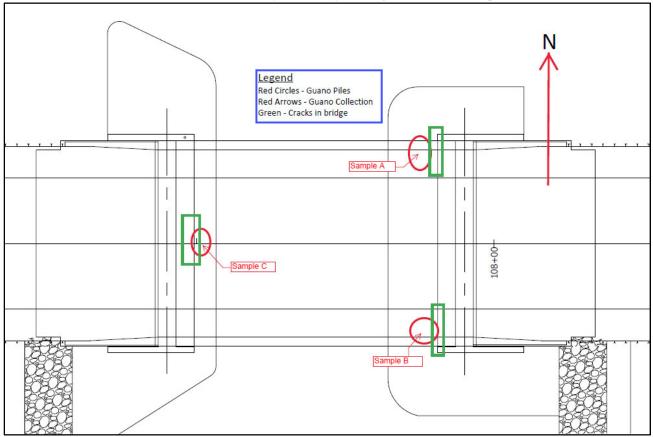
Example map for a guano collection plan, showing top-down view of a bridge, showing linear guano piles located along the abutment walls (underneath the structure's expansion joins). Arrows indicate proposed sample collection locations (Photo provided by Indiana Department. of Transportation).
